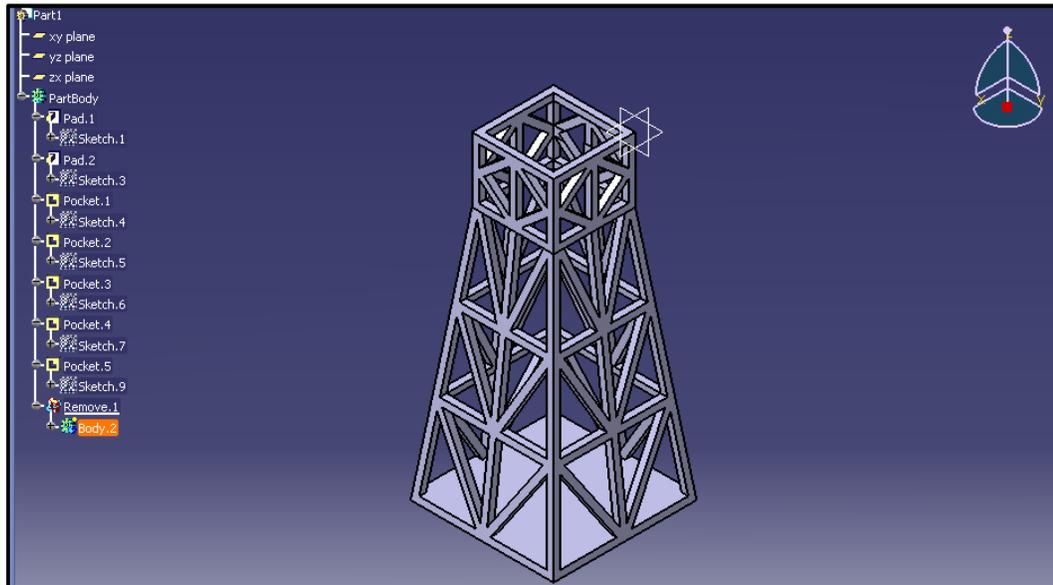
Jacket Structure drawing (isometric view) with 1 m x 1 m cross-sectional area of steel members.
